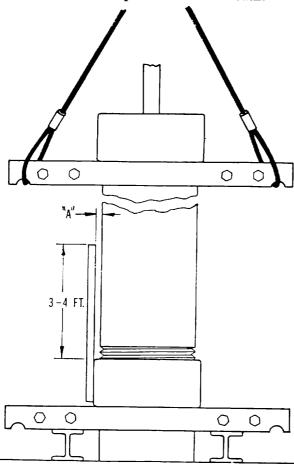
ALIGNMENT OF PIPE AND COUPLING
